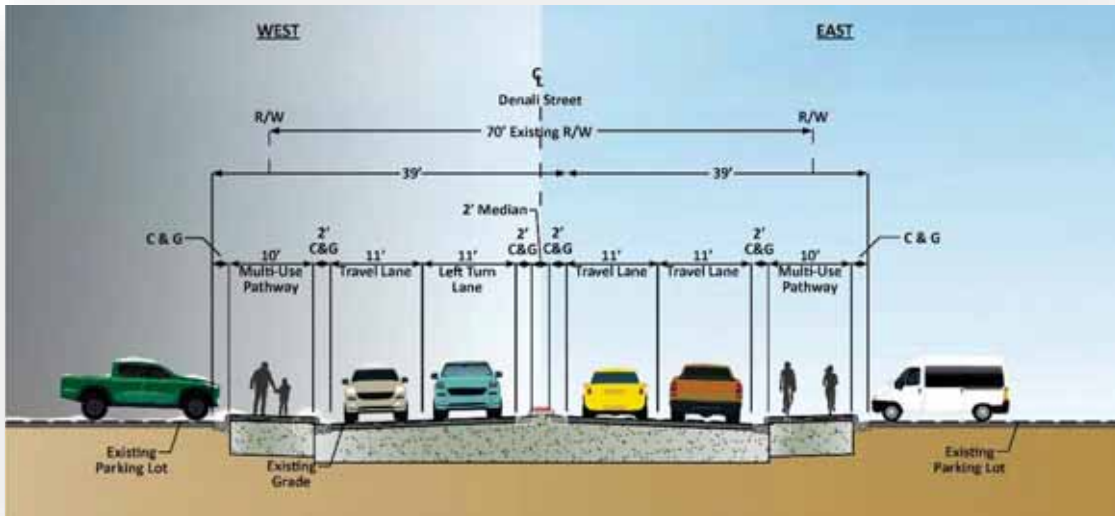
Denali Street (Benson Boulevard to Northern Lights Boulevard) – Alternative 3
